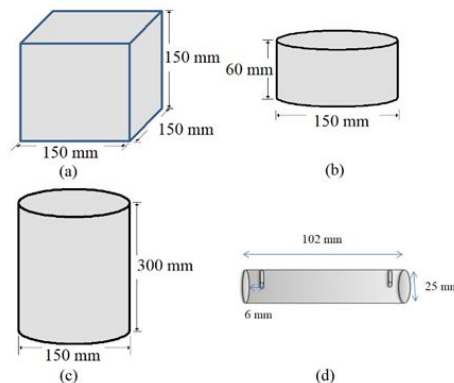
Dimensions of concrete specimens (a, b, c, d)
